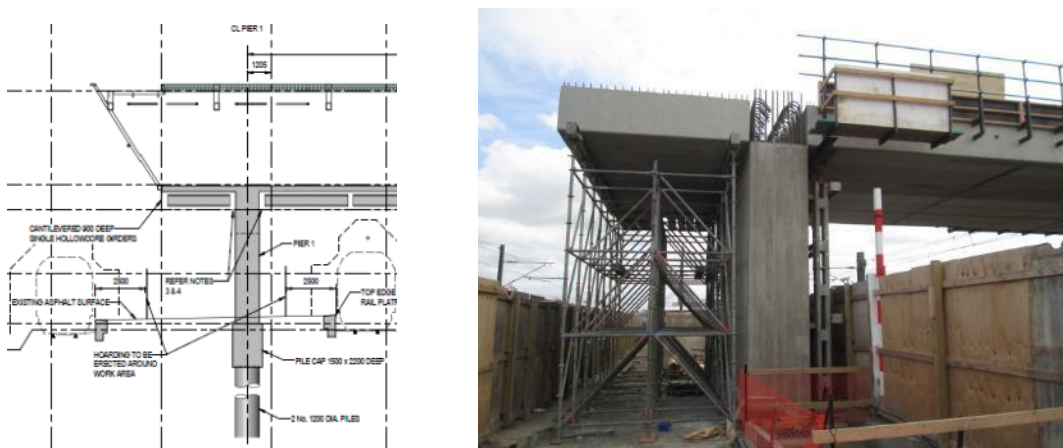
The end pier at train platform, note the tight working area behind hoarding.
